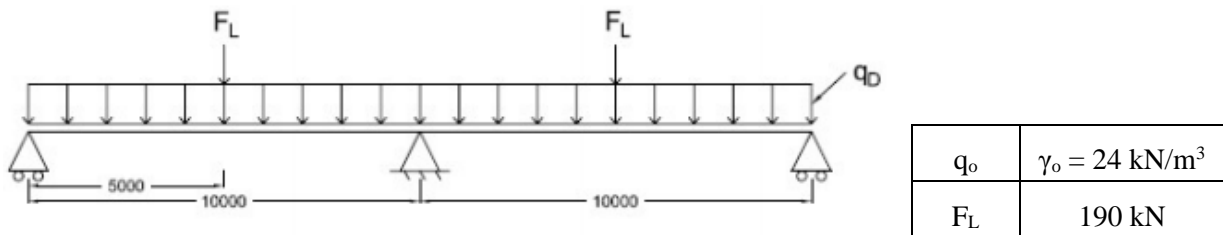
(from left to right): (a) Bridge span. (b) Loading
